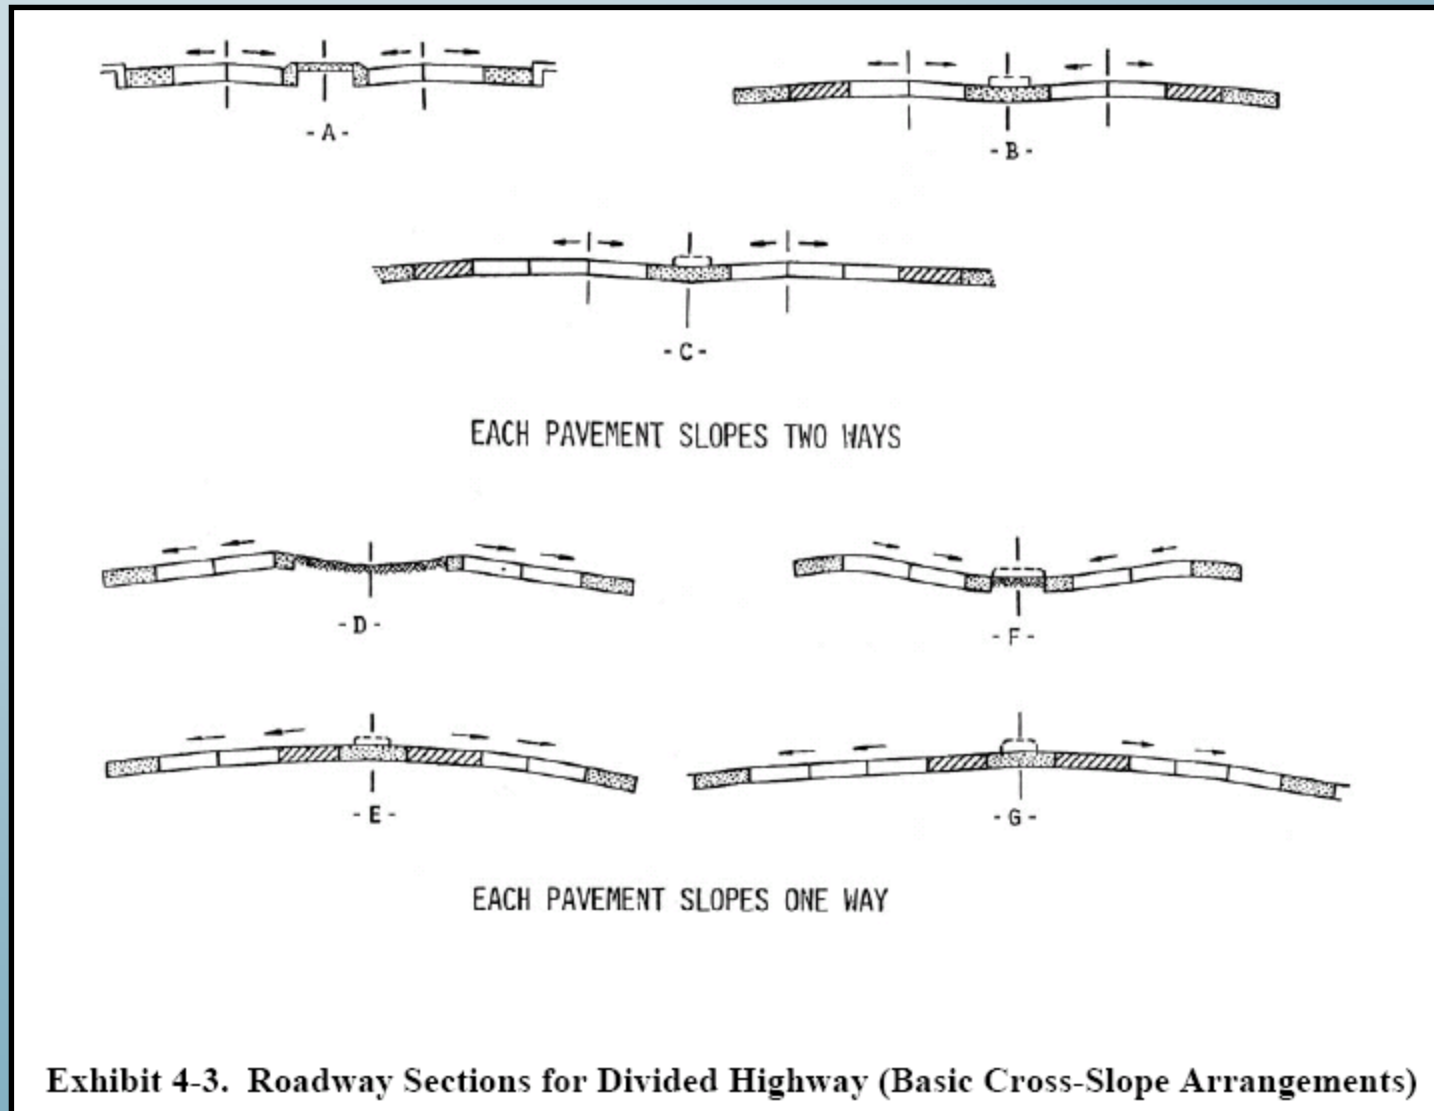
Roadway Sections for Divided Highway (Basic Cross-Slope Arrangements)
